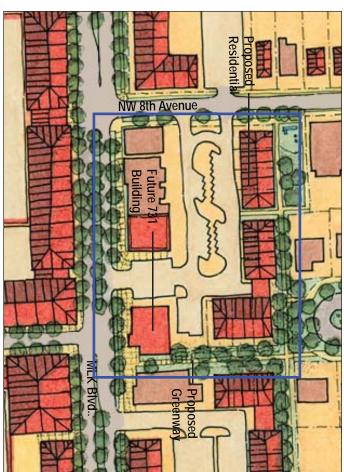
Site Plan of proposed 731 Building Ultimate Site Buildout
